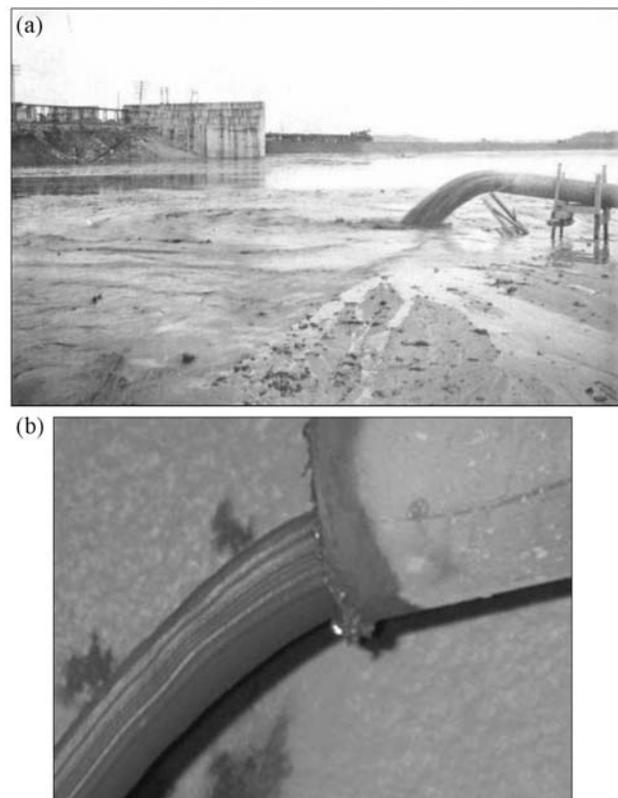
Various forms of backfill: (a) surface placement of hydraulic fill in a tailings dam; (b) discharge of paste fill from a reticulation pipe underground.
